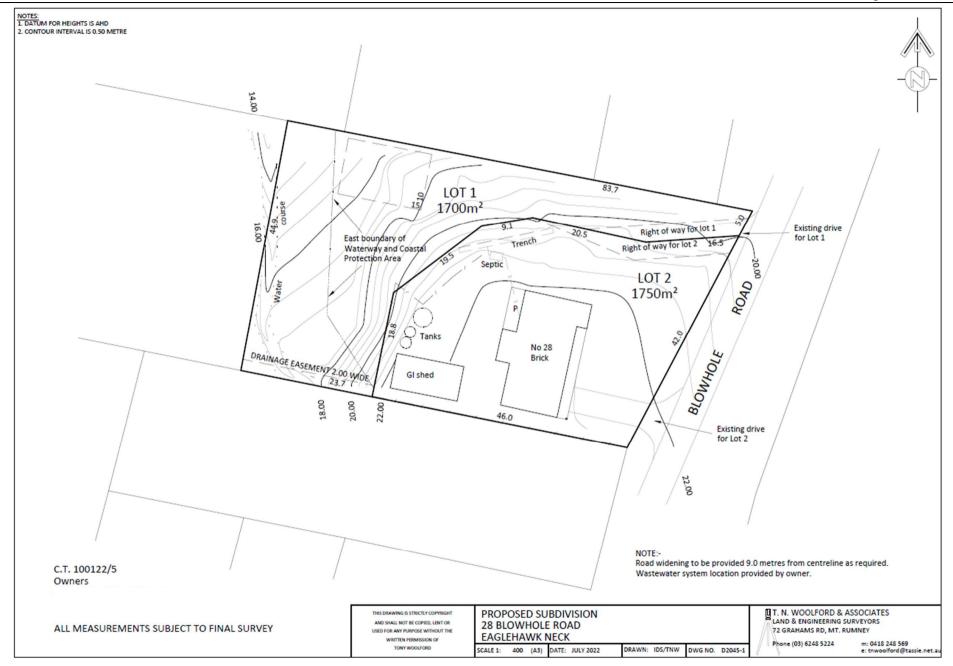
Plan of subdivision for 28 Blowhole Road, Eaglehawk Neck
